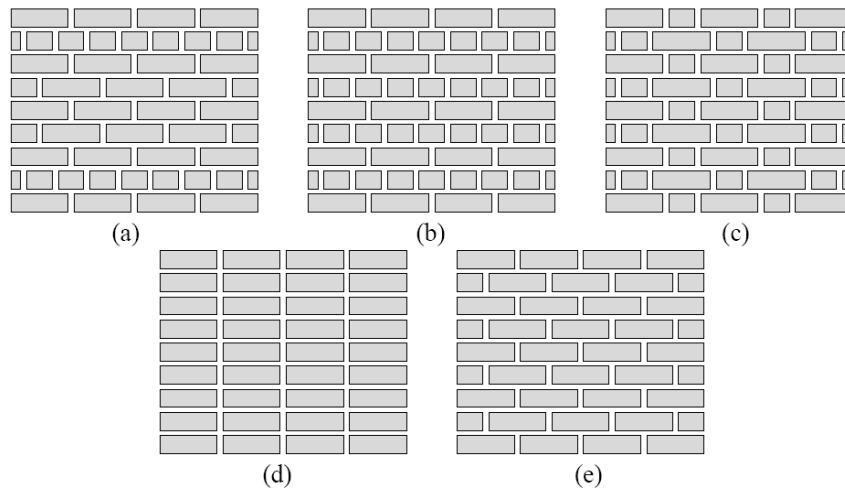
Different arrangements for brick masonry: (a) American bond; (b) English bond; (c) Flemish bond; (d) stack bond; (e) stretcher bond (Lourenço et al., 1998).
